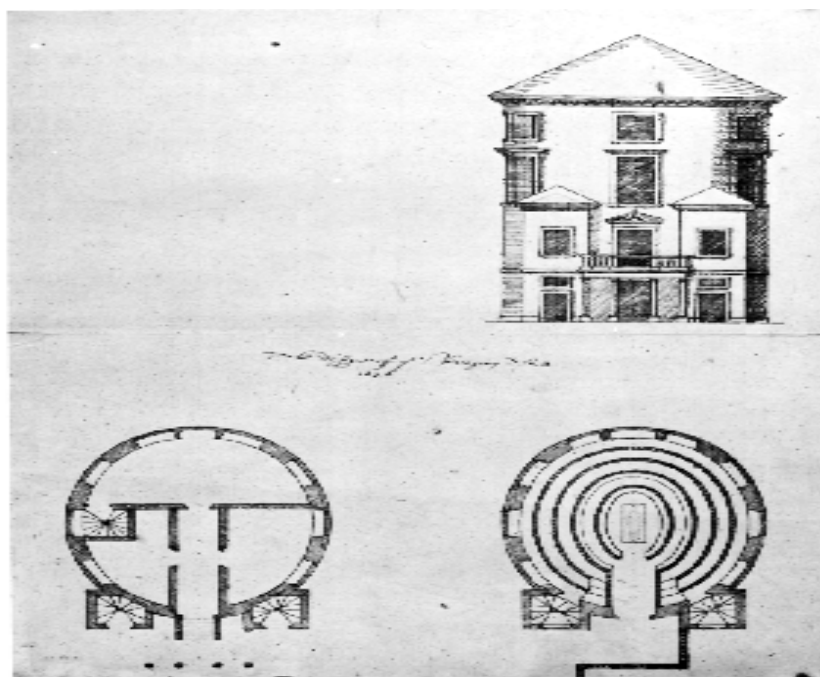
Plans and Elevation of Inigo Jones's design for the Barber Surgeons' Anatomy Theatre, 1636
